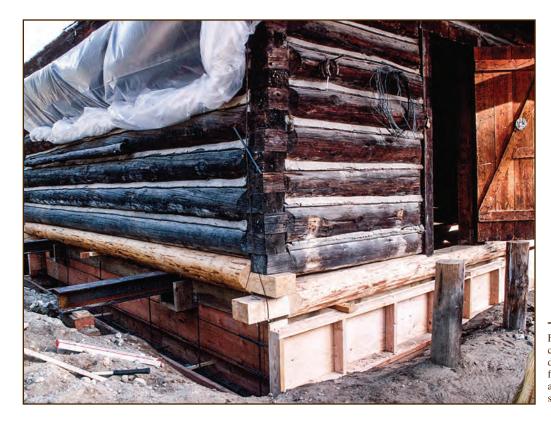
Preservation crewmembers replaced deteriorated logs and constructed forming for the new foundation around the steel beam needles that support this cabin.
